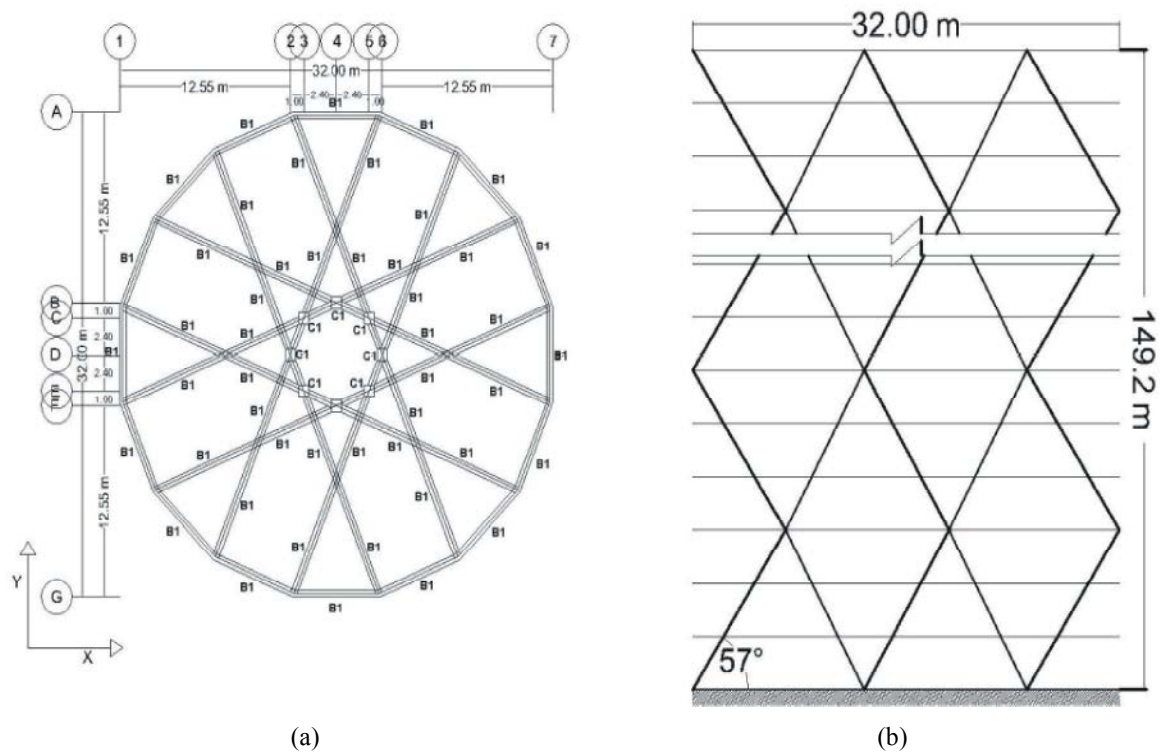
Typical (a) Circular Floor Plan and (b) Elevation of 43-storey Buildings
